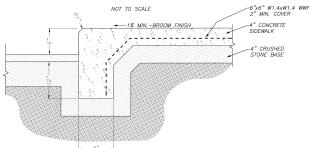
### DETAIL "E" ACCESSIBLE RAMP IN SIDEWALK
